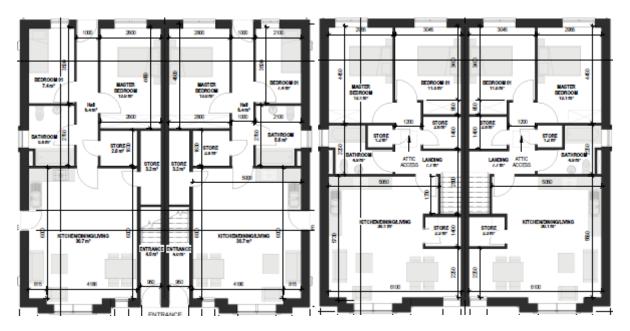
Ground floor level (left) and first floor level (right) of Maisonette buildings accommodating Maisonette Types 7.1-7.4.
